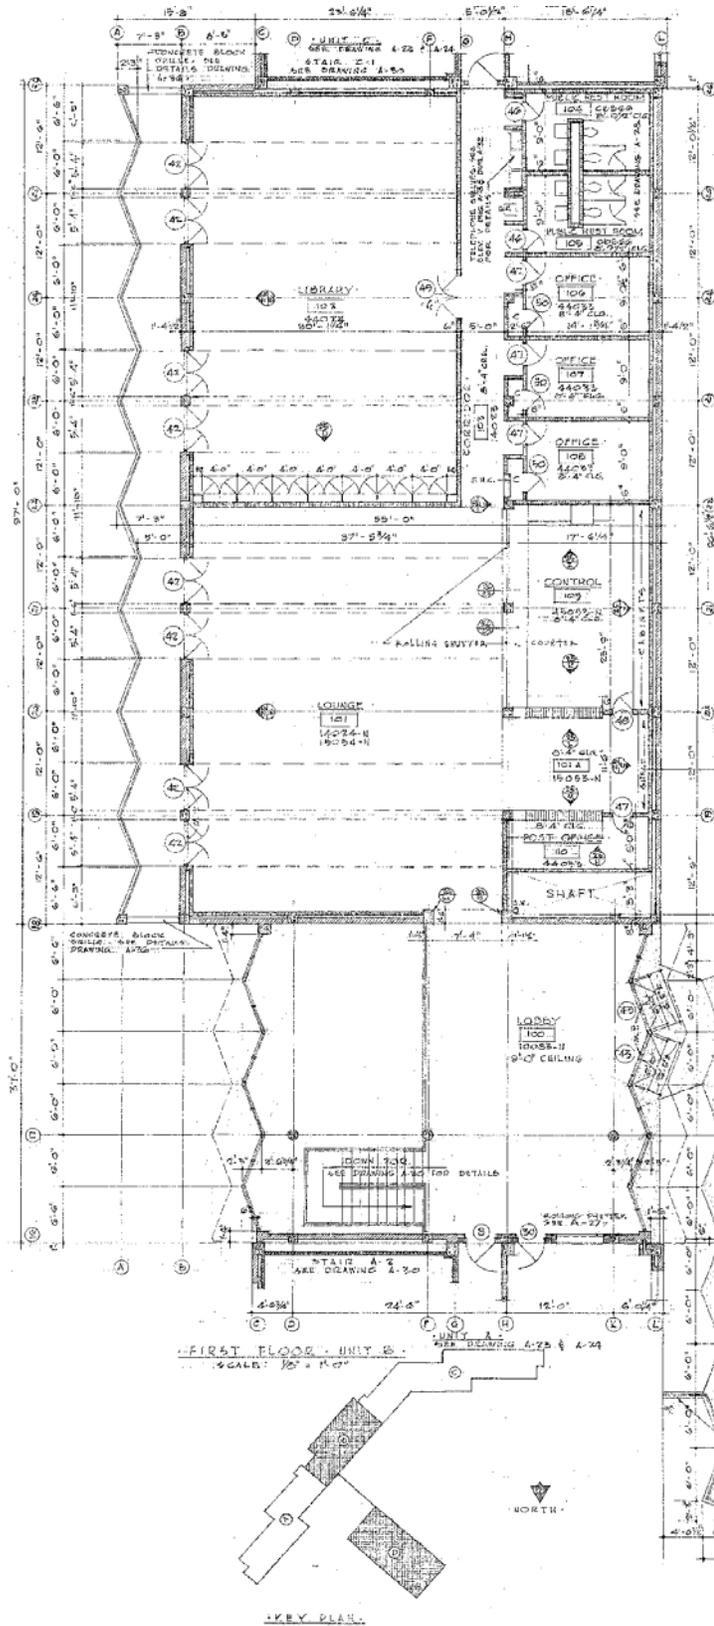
Original Construction Document, First Floor Public Spaces [9]
